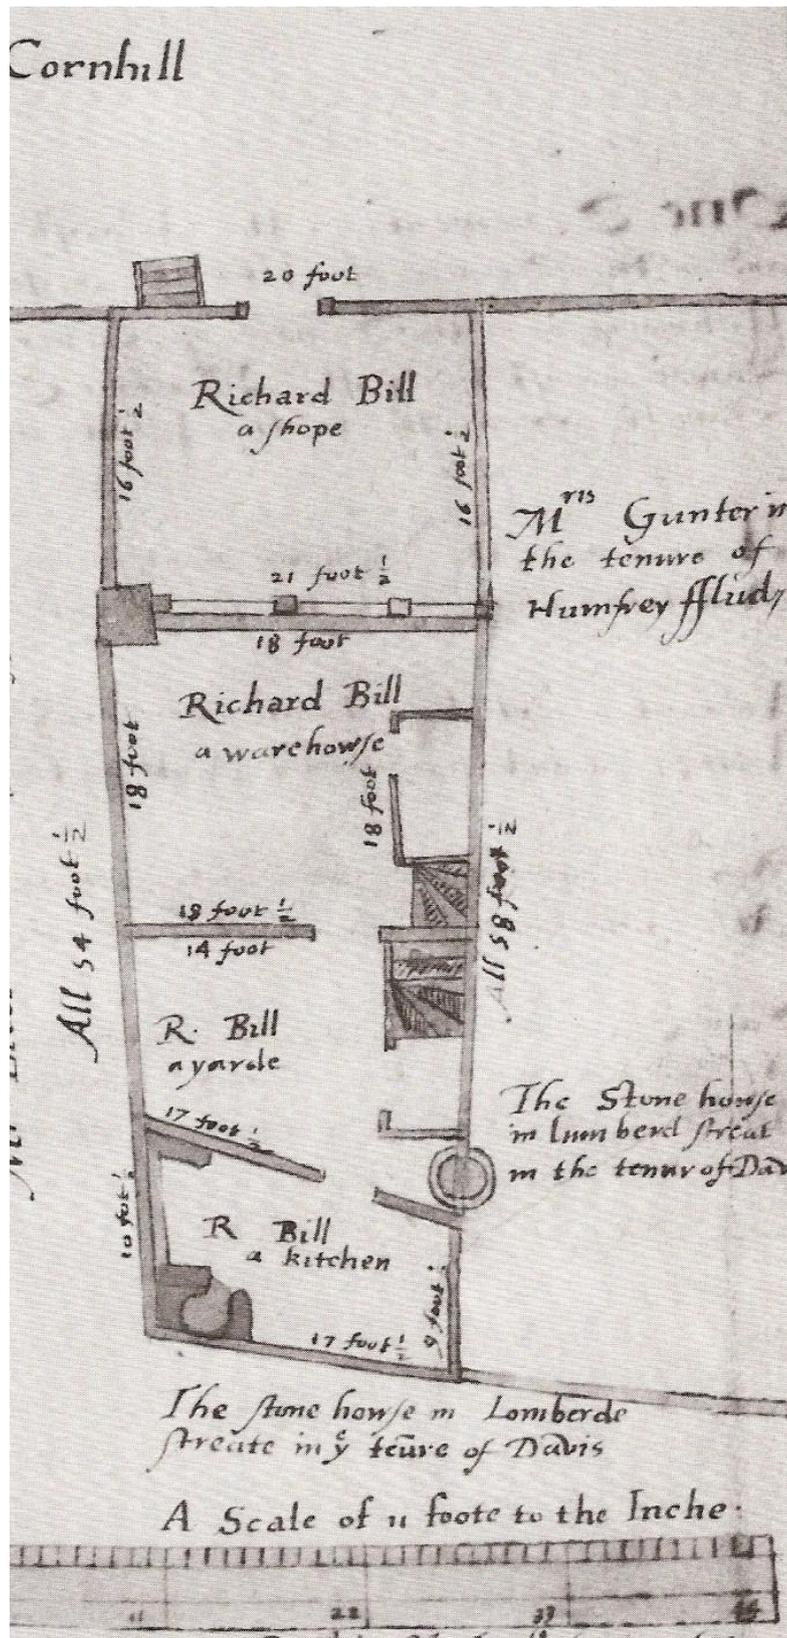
Ground Floor Plan. North is to the top of the plan.
